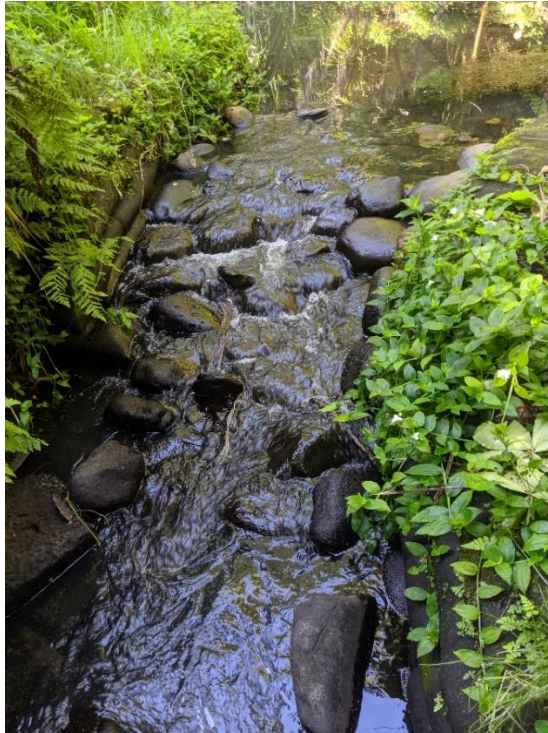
Rock ramp installed below the pool downstream of the culvert to backwater the culvert.
